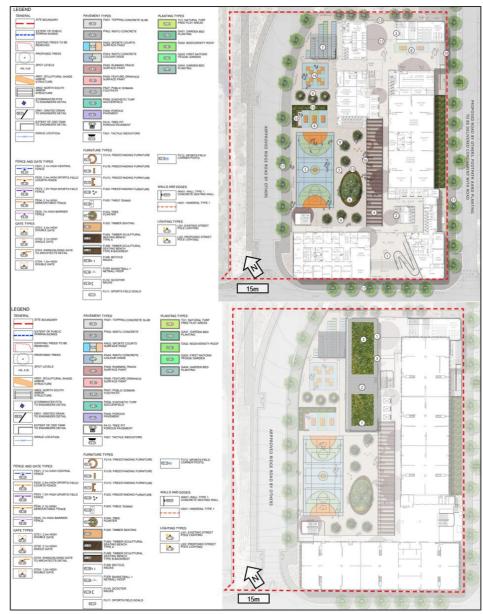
| Site planning and layout (Source: Applicant's AR 2022)
